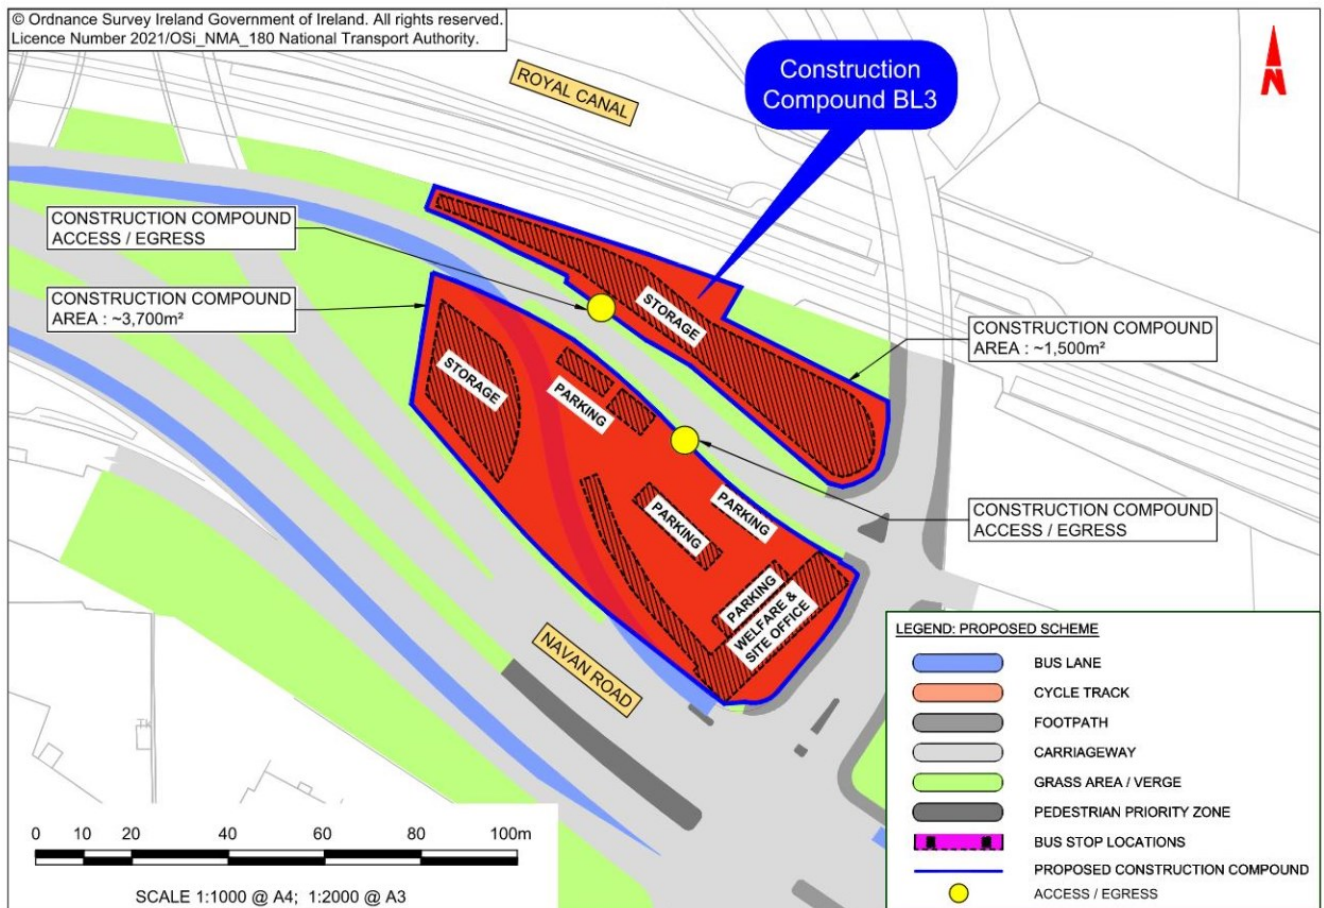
Location, Extent and Layout of Construction Compound BL3
